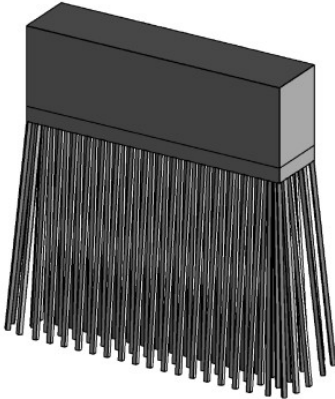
Foundation: 100 prefab concrete piles (NAP -27 m); footprint 8 × 36 m [34]
